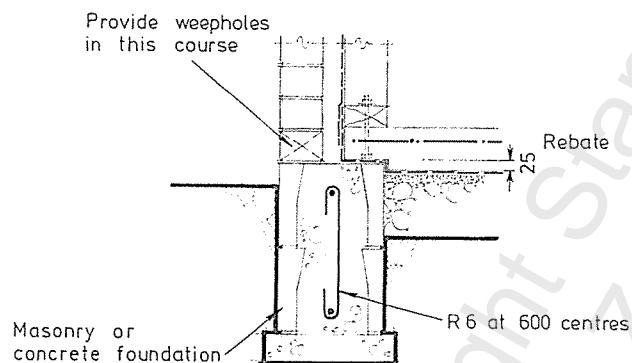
Foundation walls of concrete slab-on-ground floors
